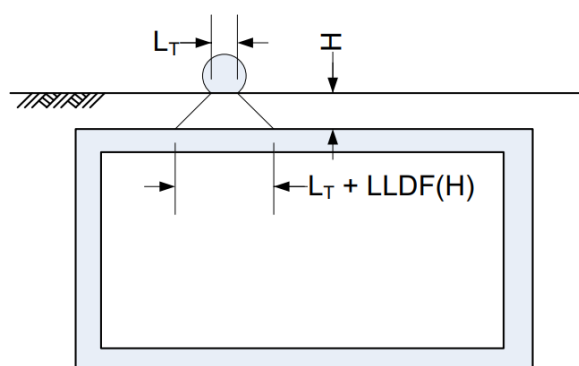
Live Load Distribution with Greater than 2 ft. of Fill for Traffic Parallel to Span (Used with permission from *WisDOT Bridge Manual, Chapter 36 - Box Culverts*, developed by the Wisconsin Department of Transportation)
